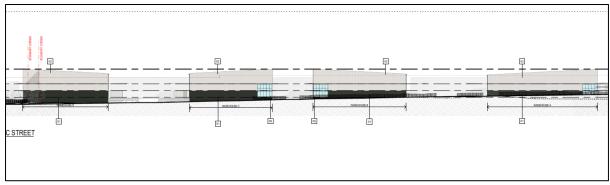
Elevation of the four buildings facing Mayvic Street (building A to the right-most & D to the left-most)
